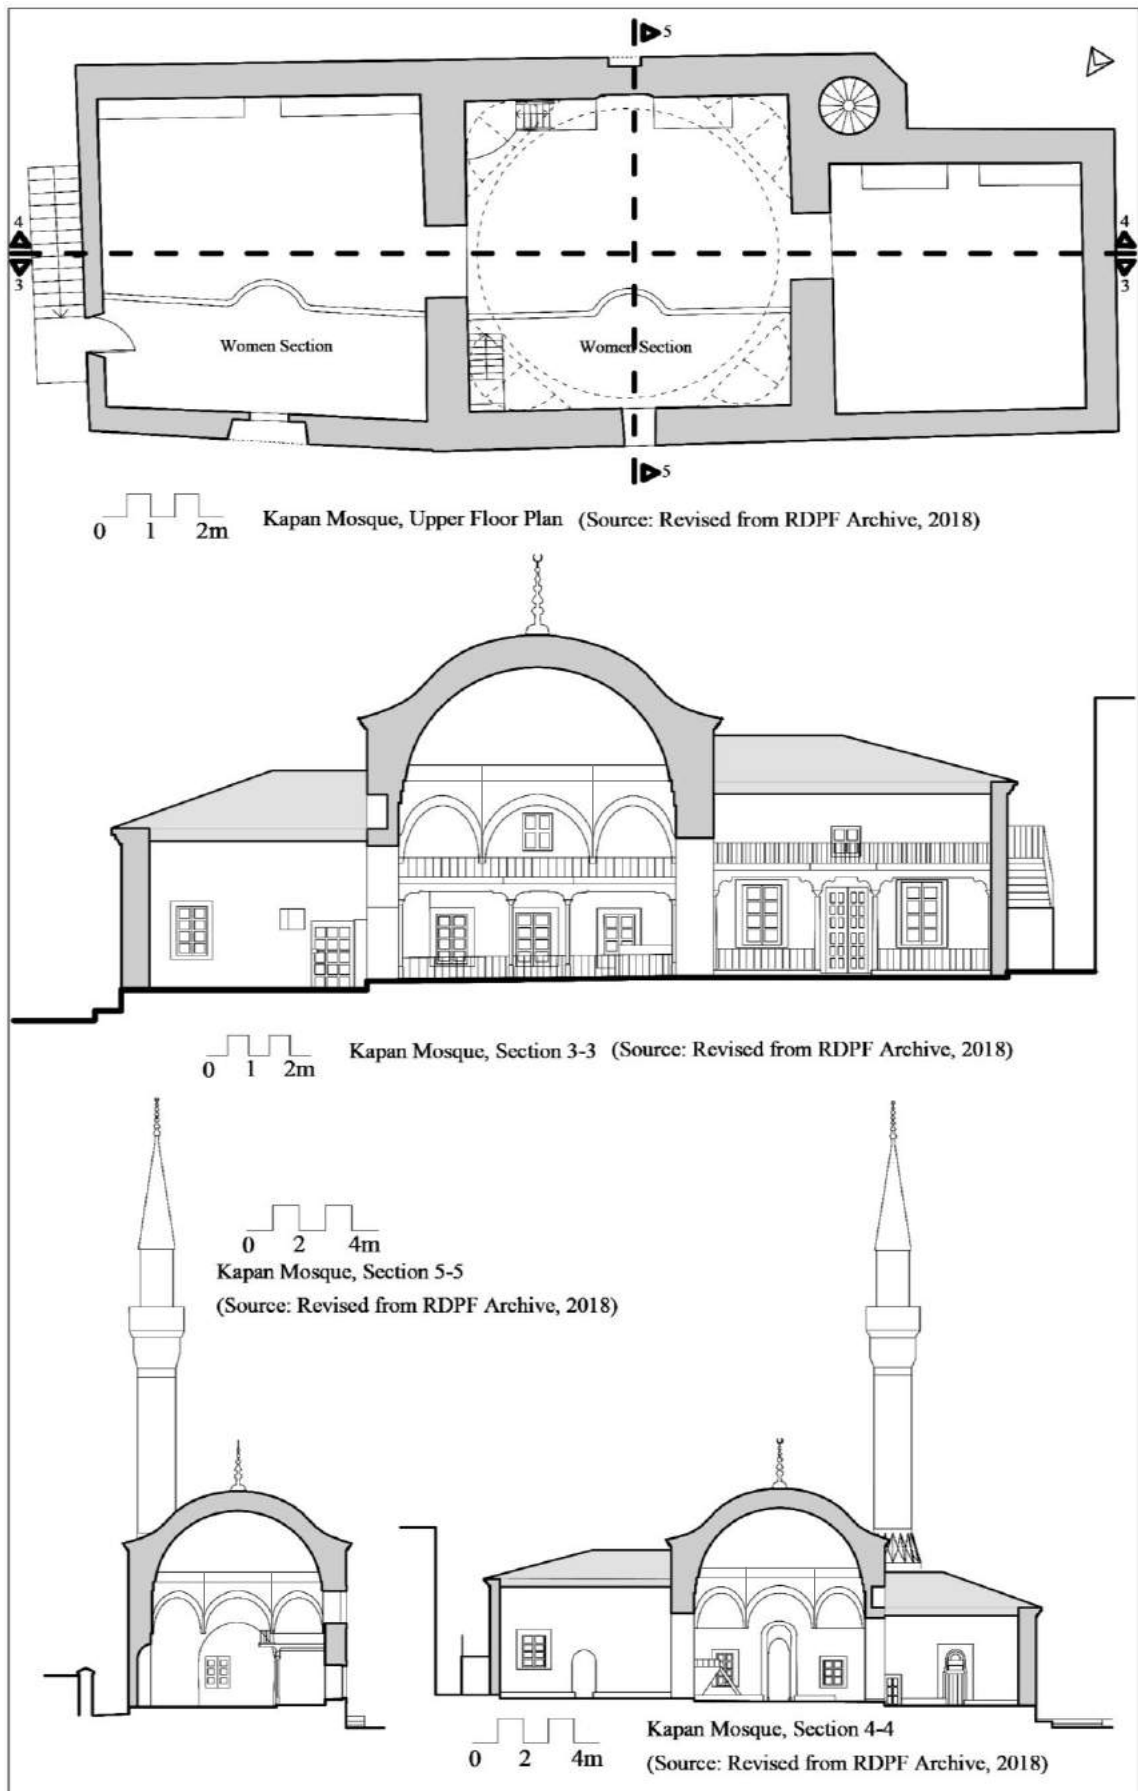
Upper floor plan and sections, Kapan Mosque
